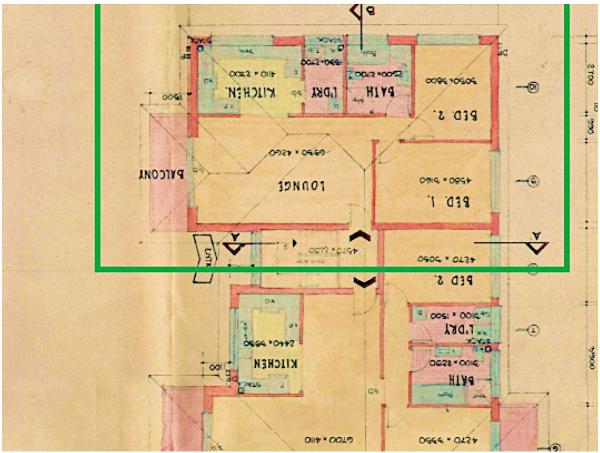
Floor plan of northern-most apartments at no. 44-48 Milton Street.
